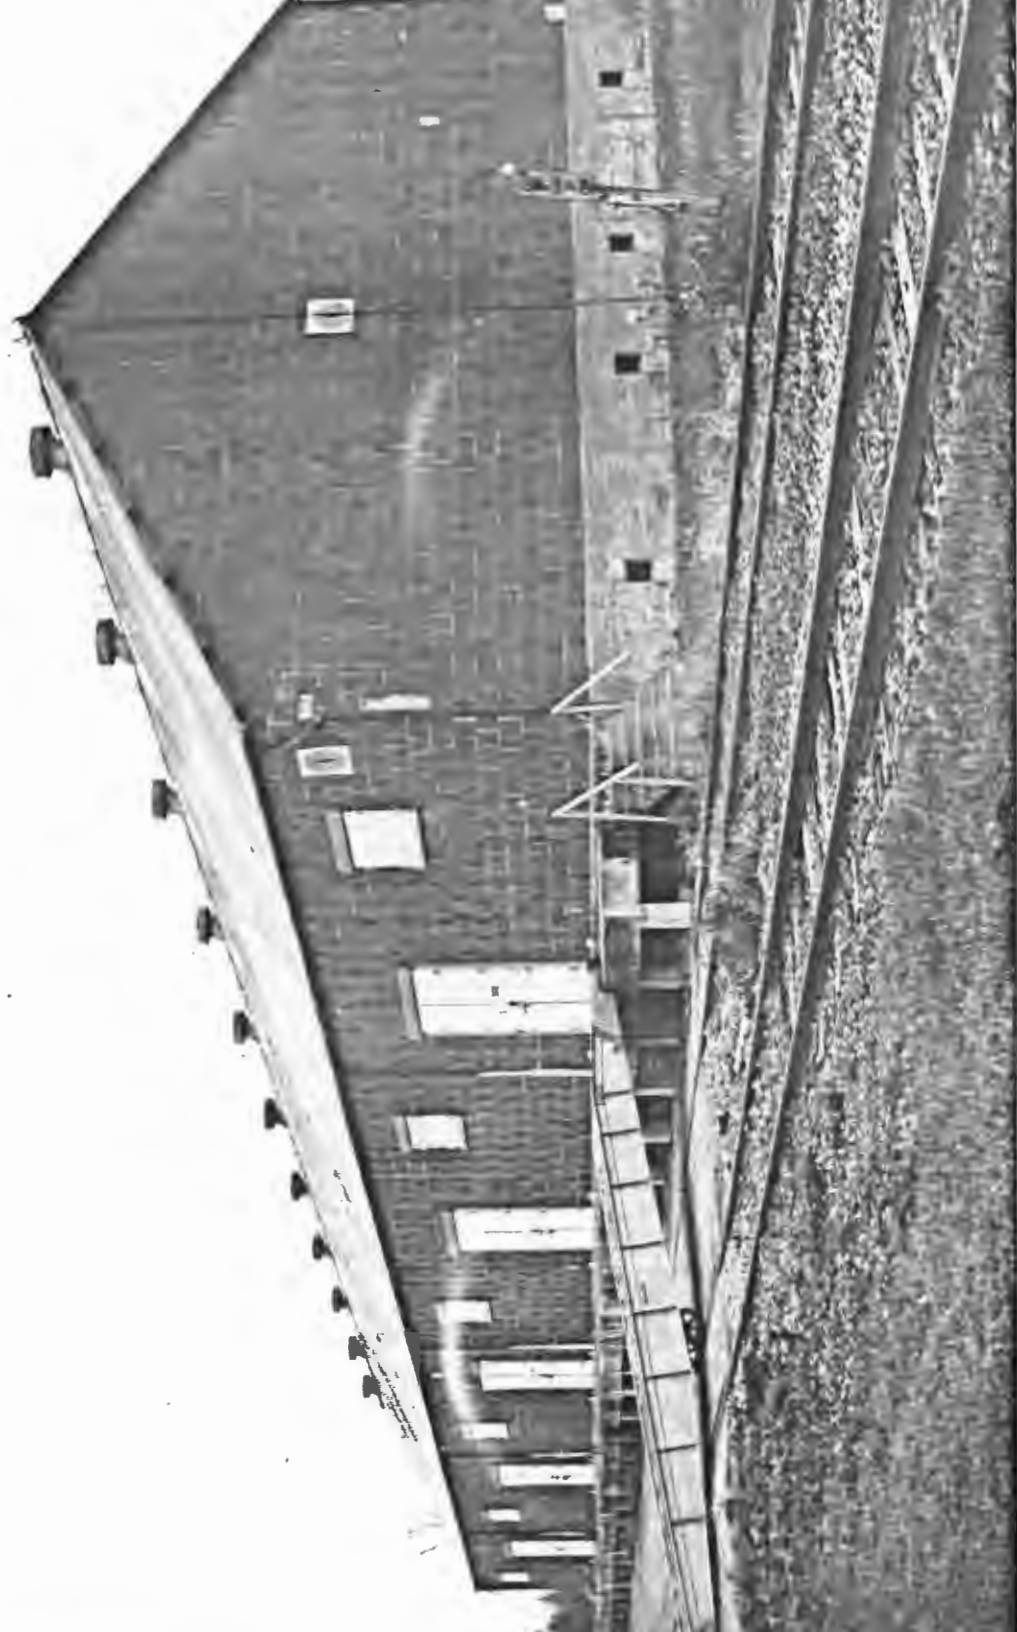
Building 2119. The building is one of eight standard above-ground magazines erected west of the igloo storage area in 1941. The buildings are constructed with steel frames clad with hollow clay tile walls. Reinforced concrete loading platforms and double doors face the adjacent rail lines. (Source: Field inventory photograph, 1983, Barbara Hightower, Building Technology, Inc.)
